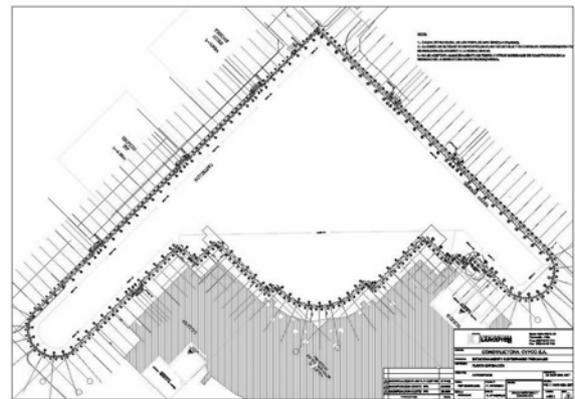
Plan view of the parking project showing position of anchors (Lancuyen 2008)
